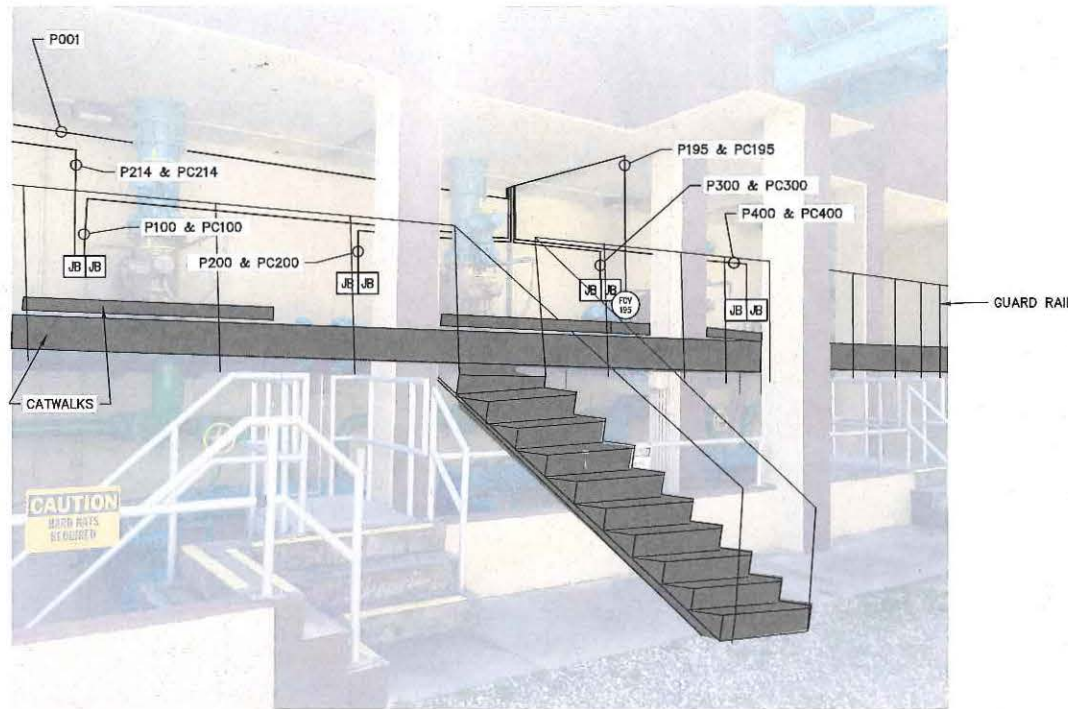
PHOTO  FILTER GALLERY CONTROL VALVE - CONDUIT PLAN II
